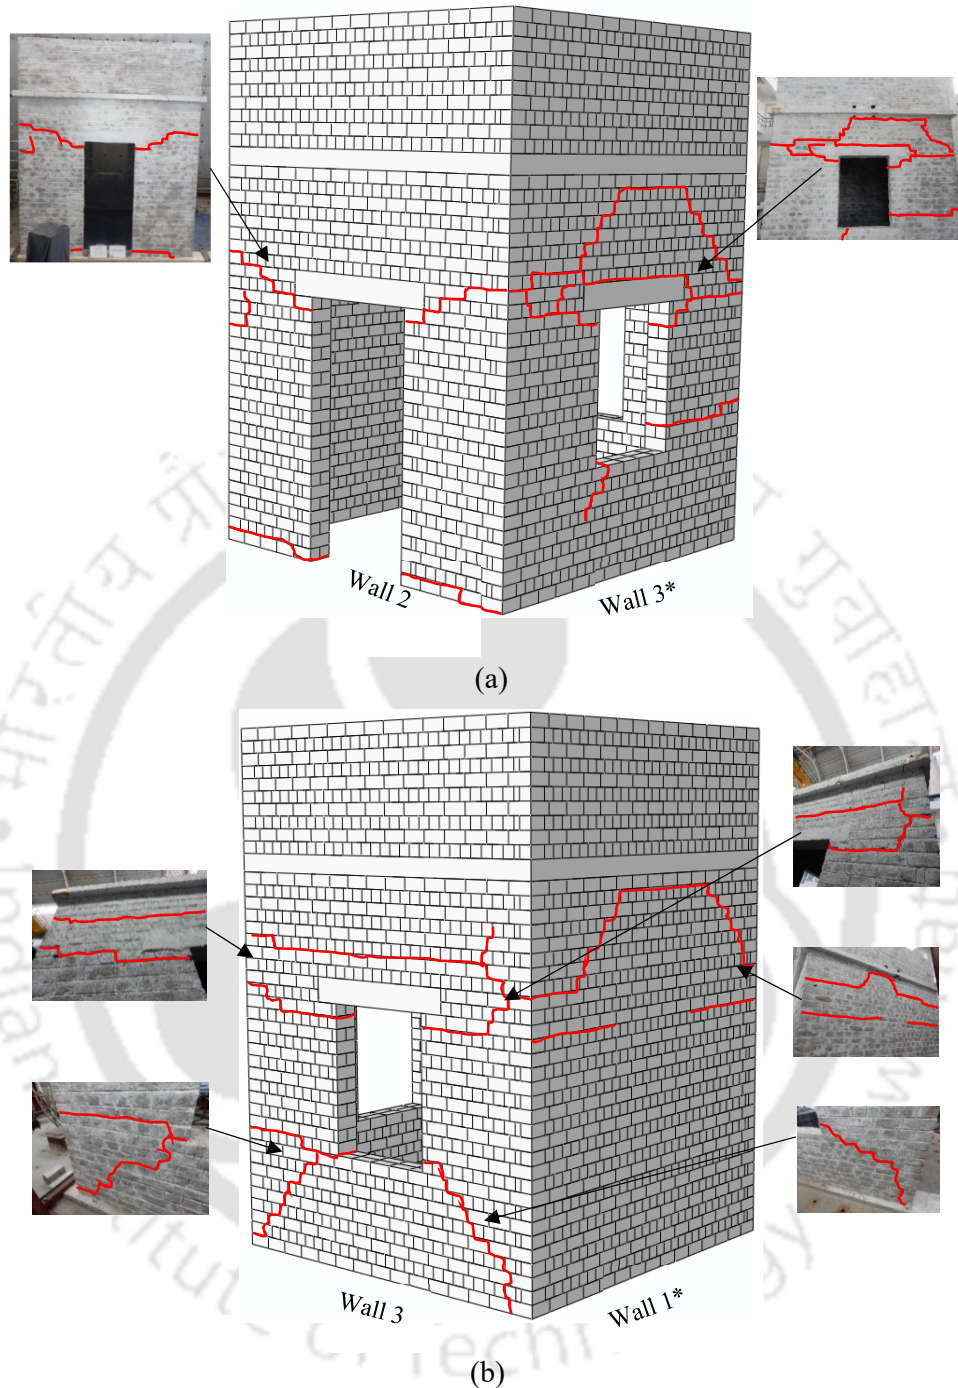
Damage pattern observed during the slow cyclic lateral load testing of full-scale URM building: (a) Damage observed in Wall 2 and Wall 3*, and (b) Damage observed in Wall 3 and Wall 1*.
